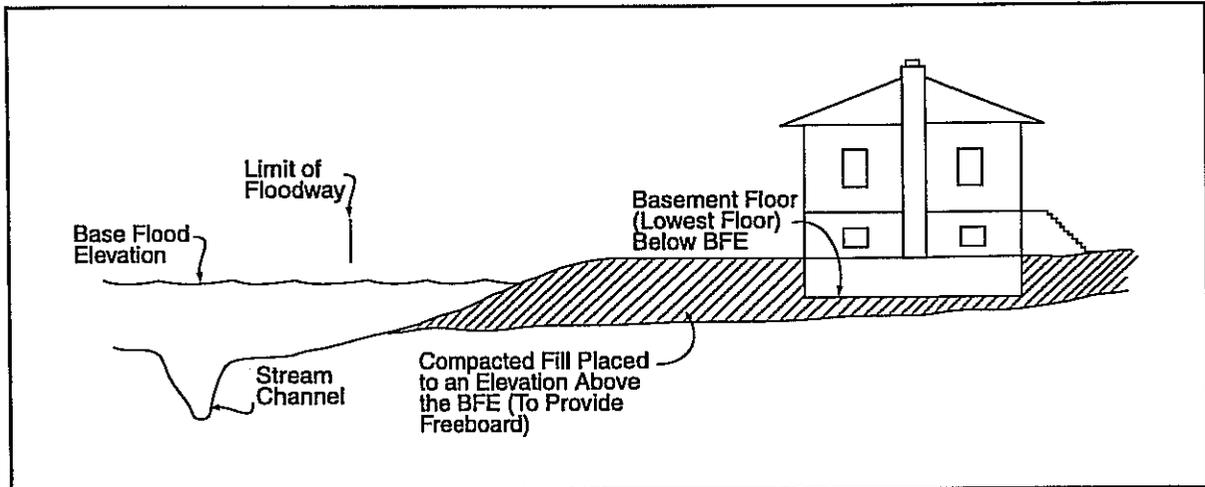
Basement foundation in fill placed above the BFE. The depth of the basement floor below the BFE is less than when no fill is placed.
